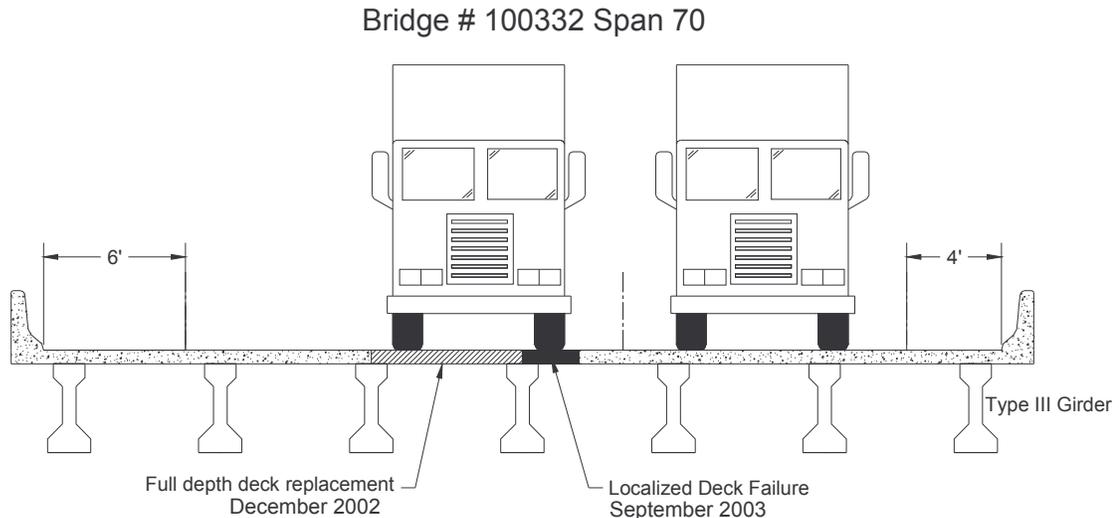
Cross Section View of Bridge# 100332, Span 70
